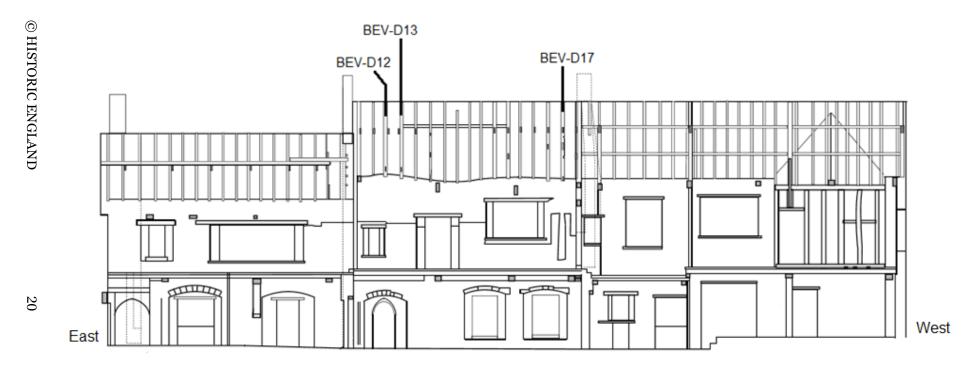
Southern elevation (looking south), showing the location of samples BEV-D12–13 and BEV-D17 (after YVBSG 2015)
